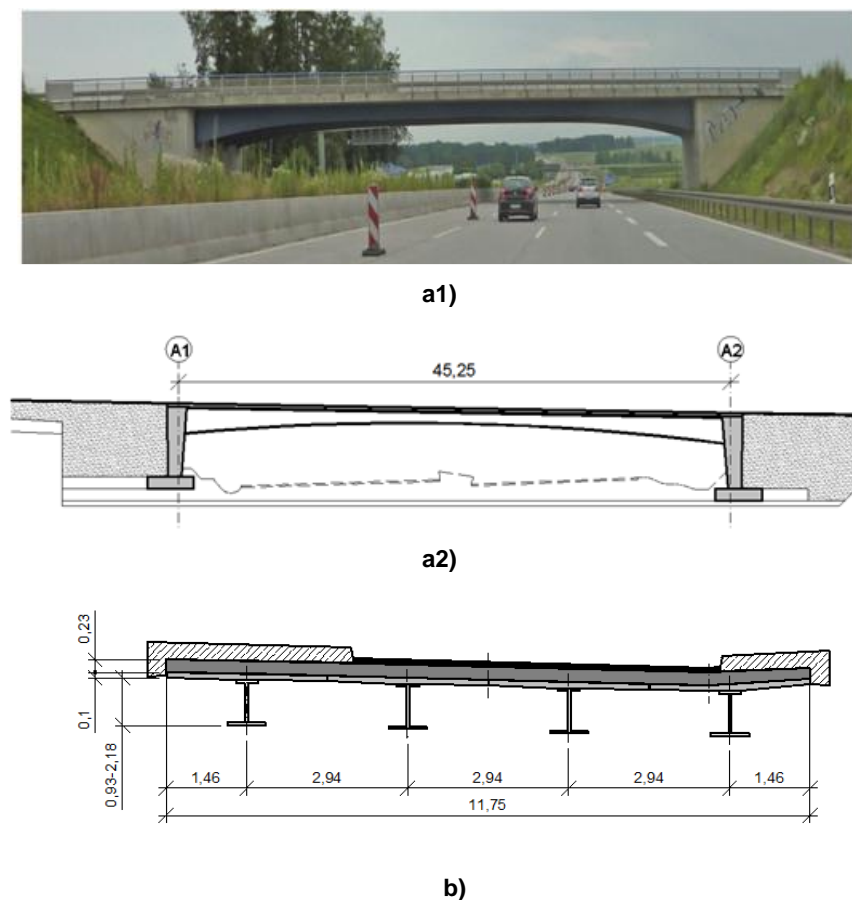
Case A1: Integral composite bridge: a1) and a2) Longitudinal view; b) Cross section with girders of variable height.
